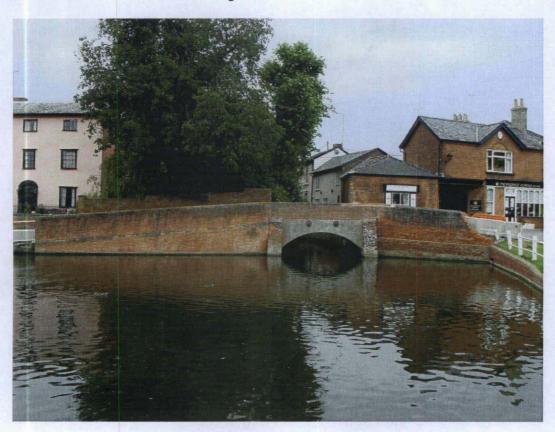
General view of the brick arch bridge from South (upstream)
